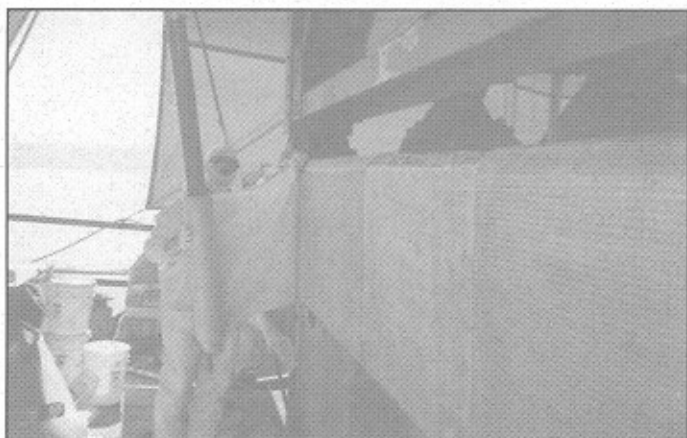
Repair of the Pier Caps of Manette Bridge in Washington State.
